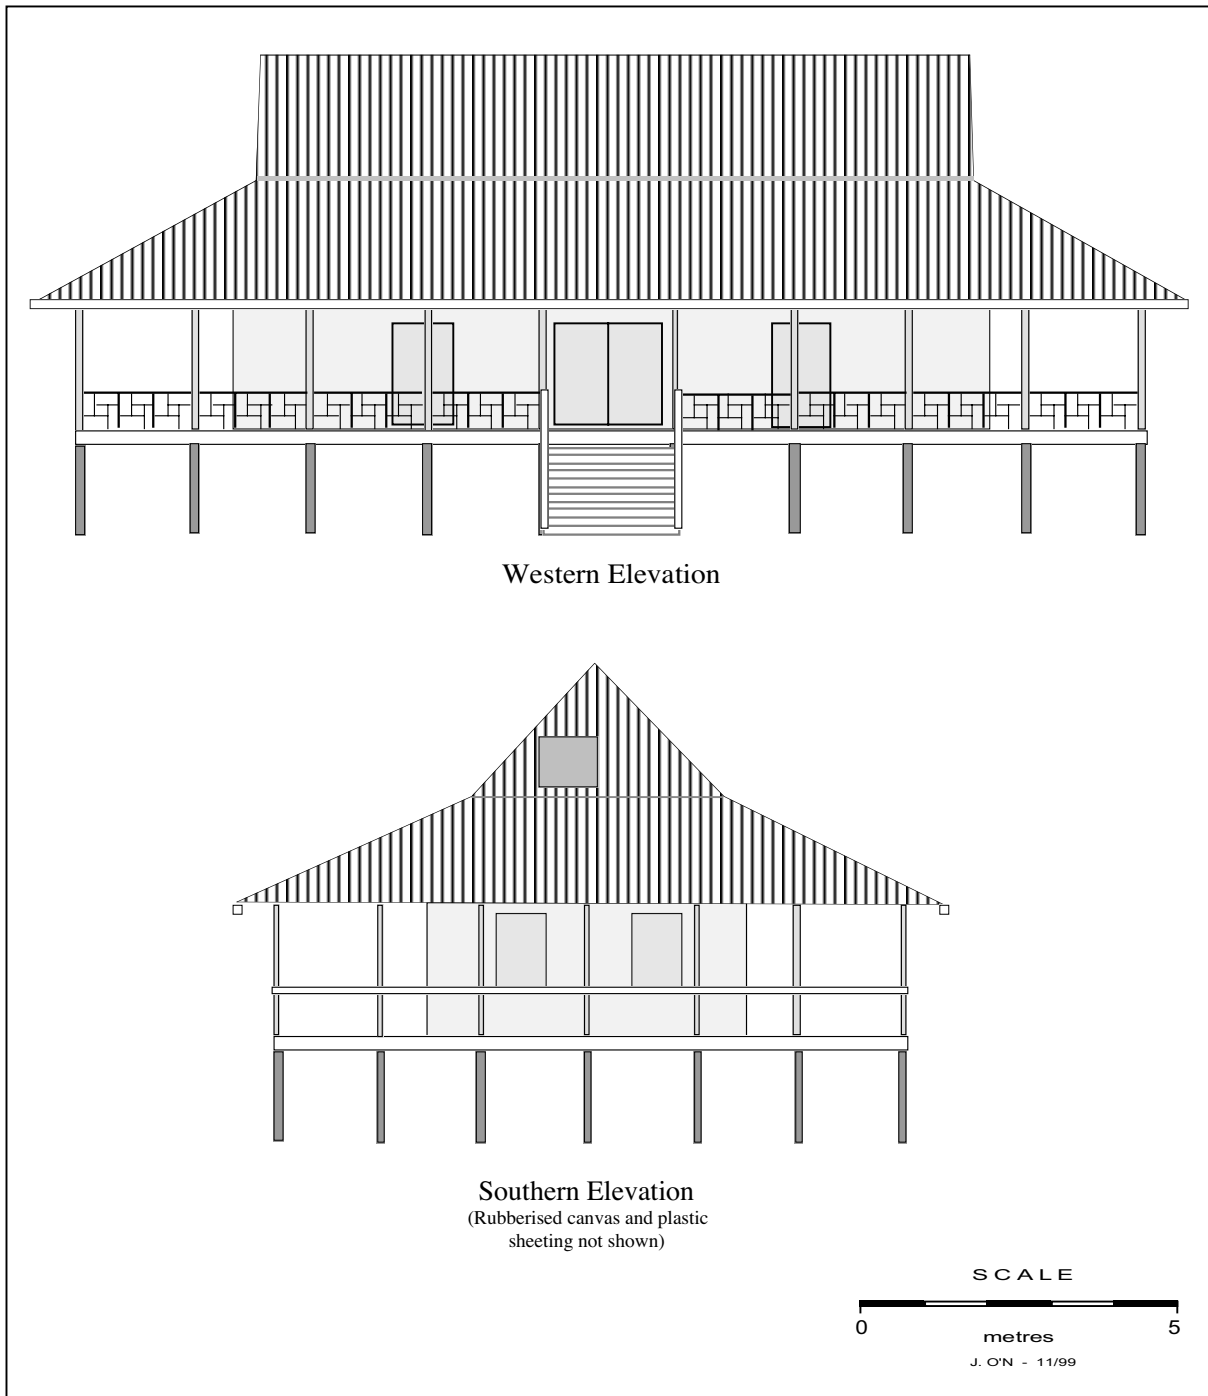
Joachim De Brum House - Southern & Western Elevations
